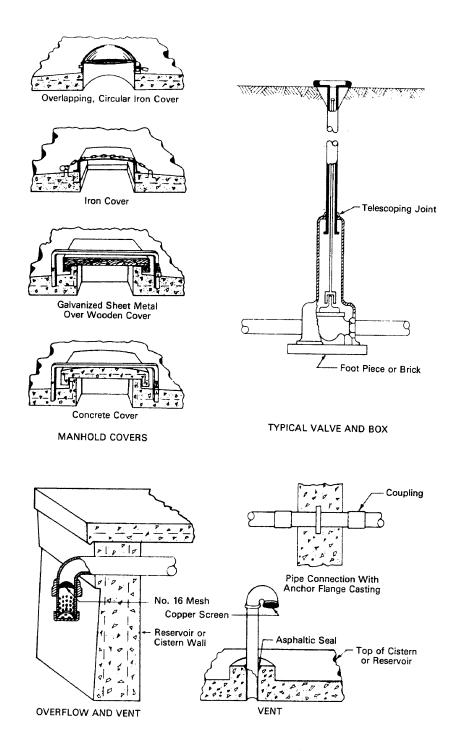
Typical Valve and Box, Manhole Covers, and Piping Installation
